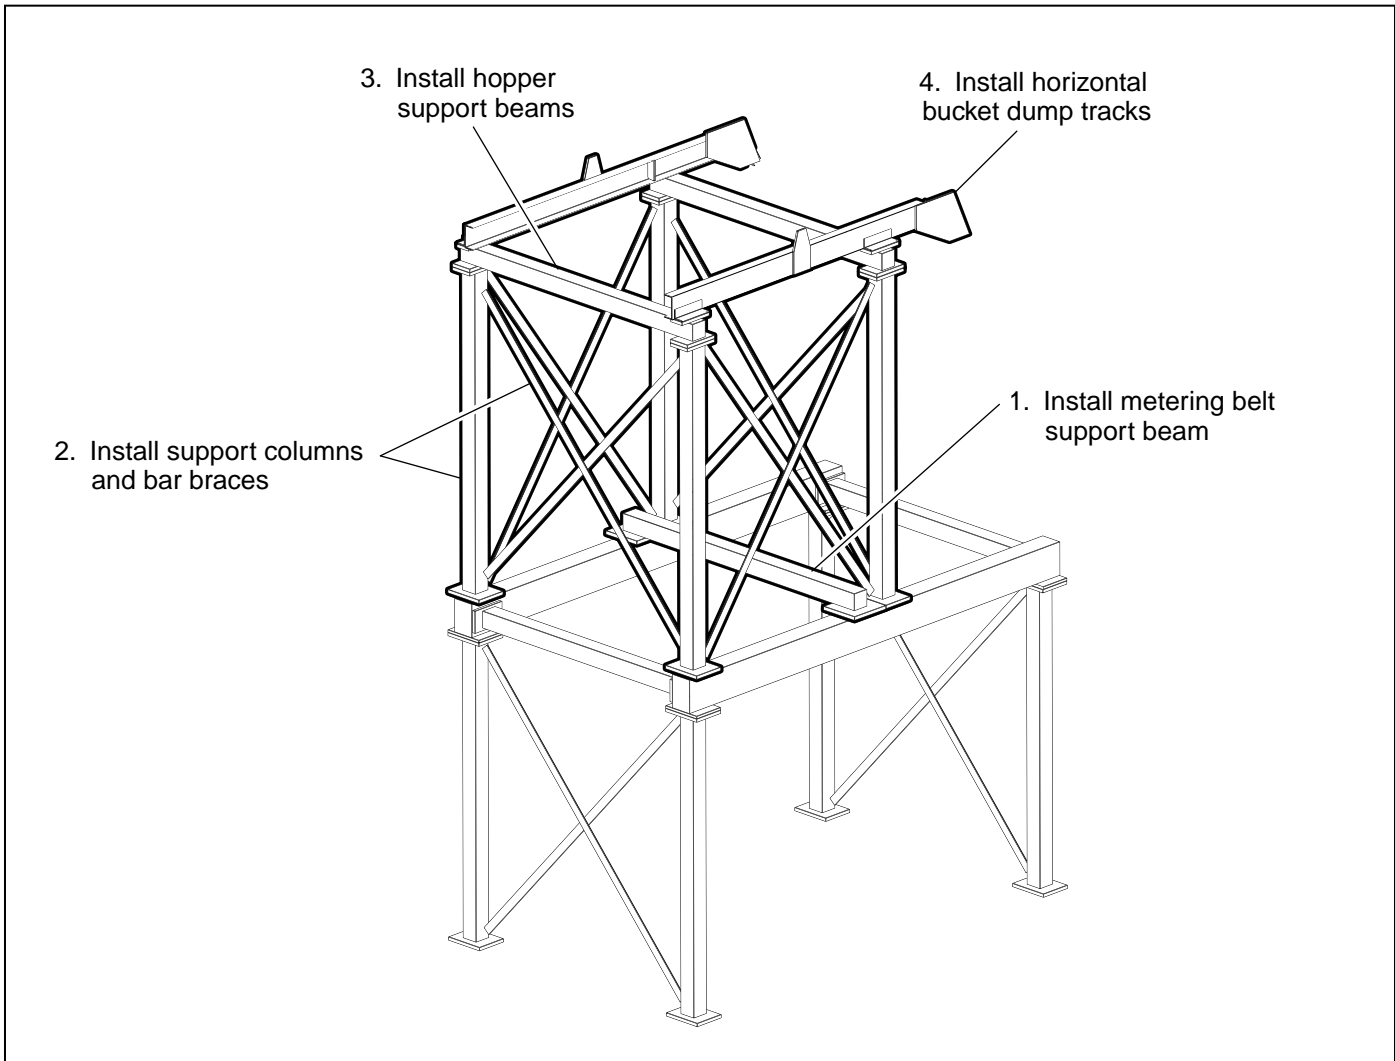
Tier B Supports, Columns and Dump Tracks
